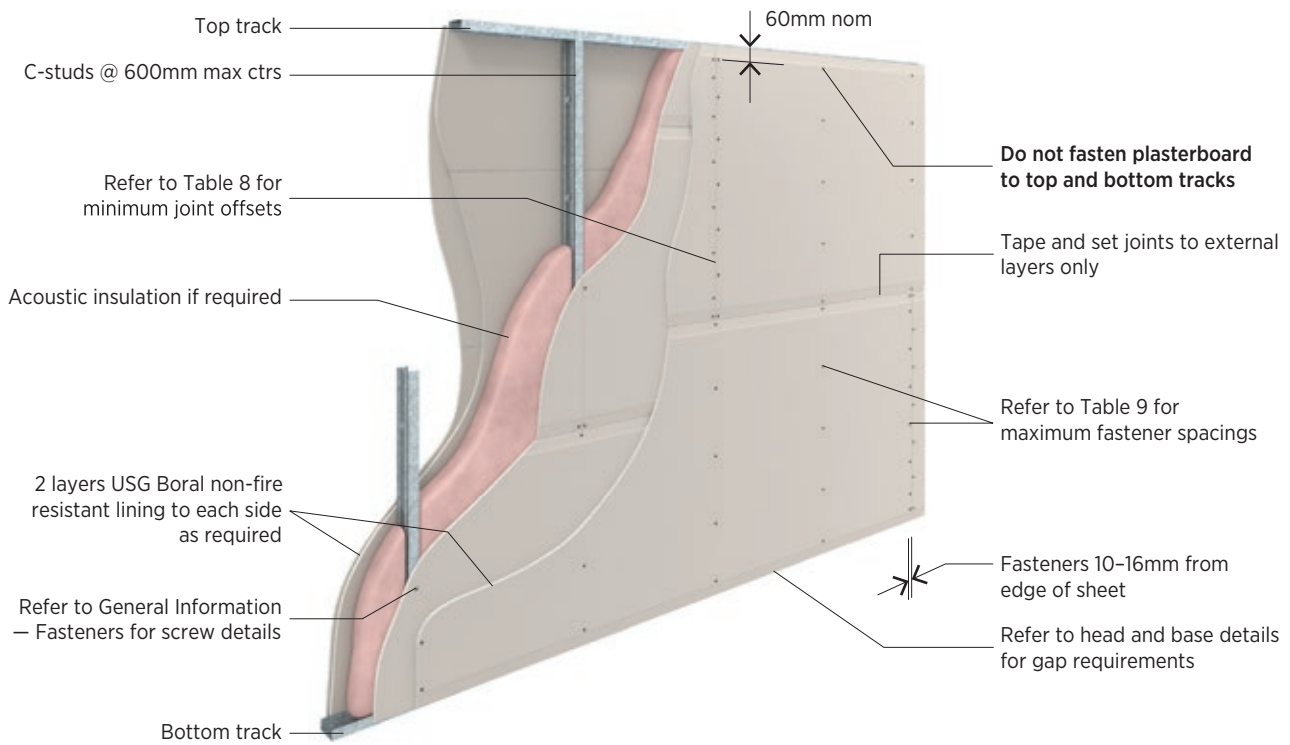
Non-fire-rated Steel Stud - Horizontal Fixing - Double Layer
